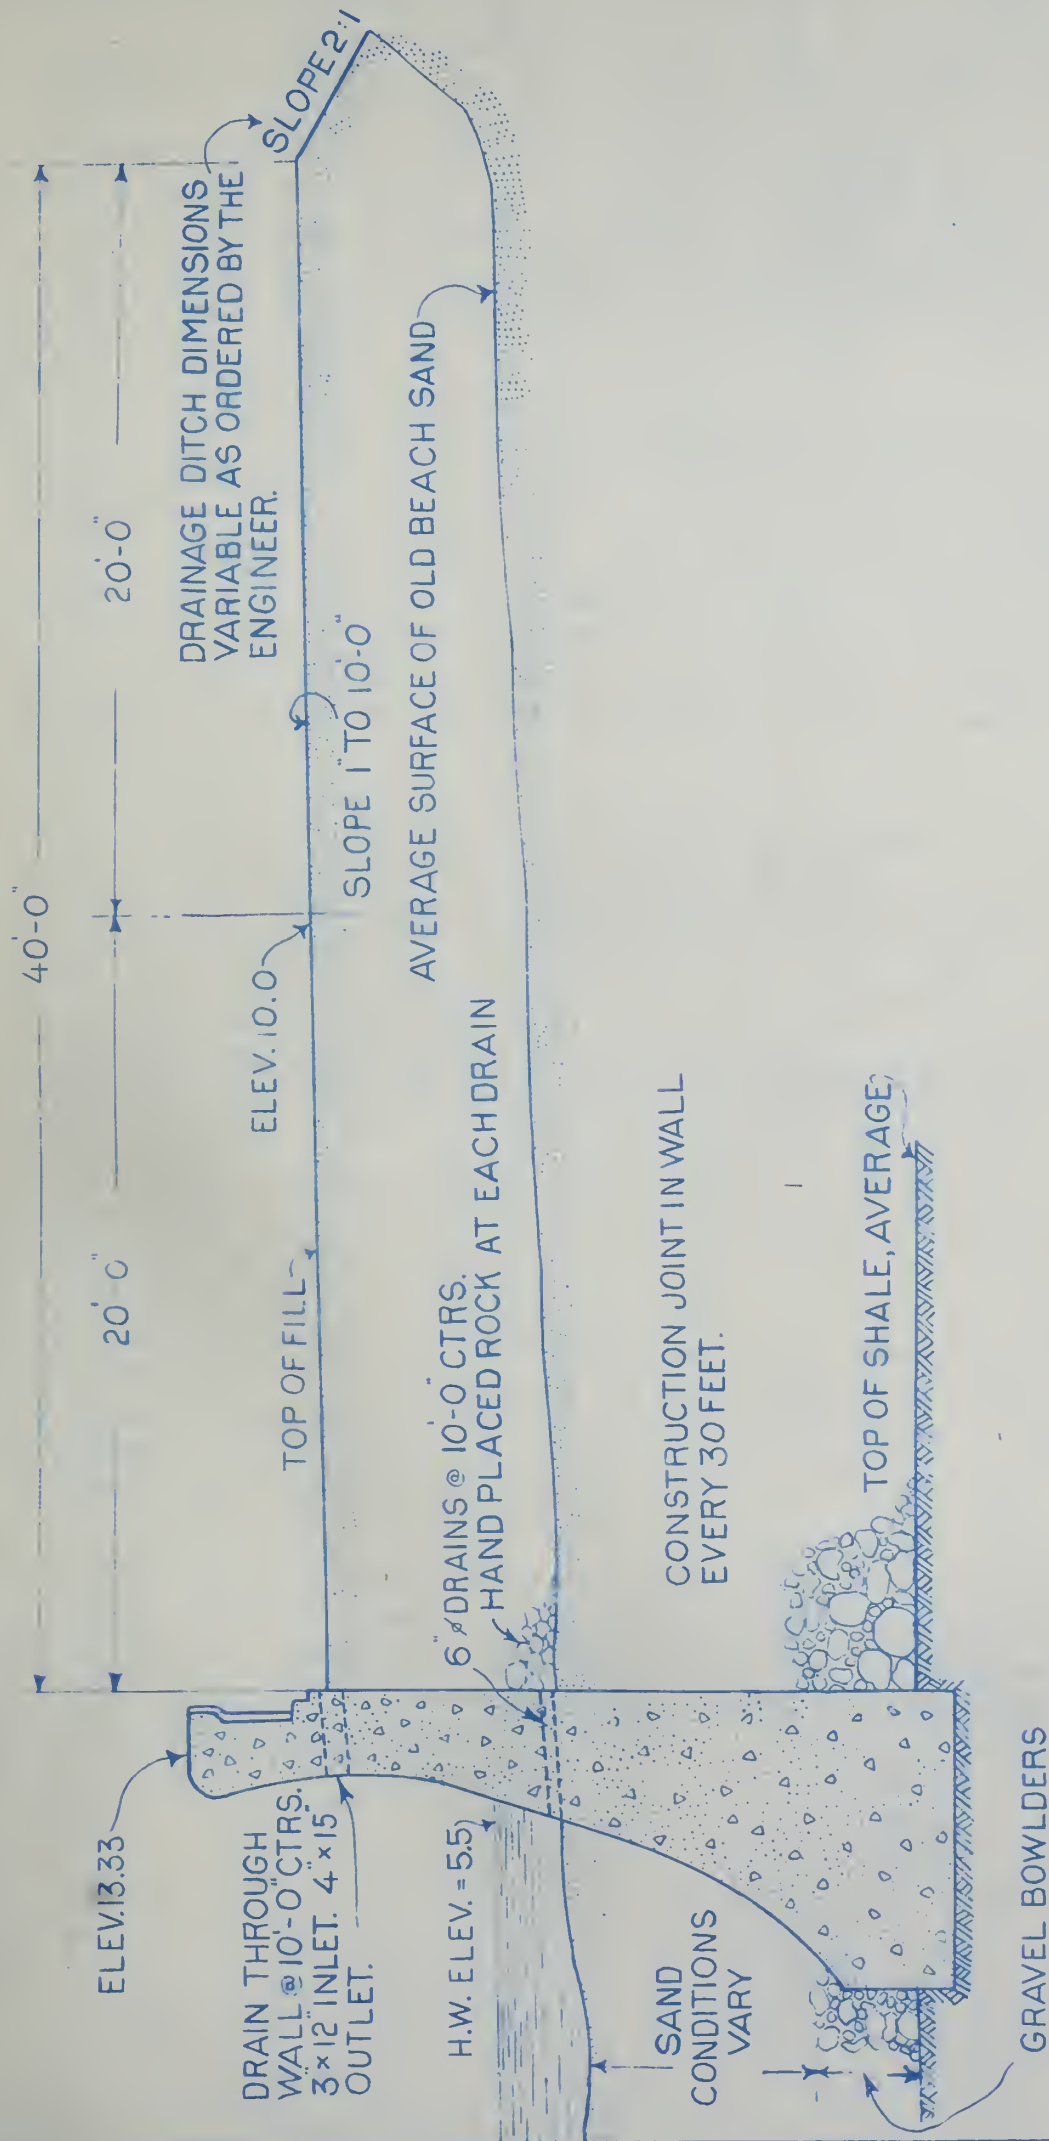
TYPICAL CROSS SECTION OF SEA WALL AS DESIGNED BY THE CALIFORNIA HIGHWAY COMMISSION
